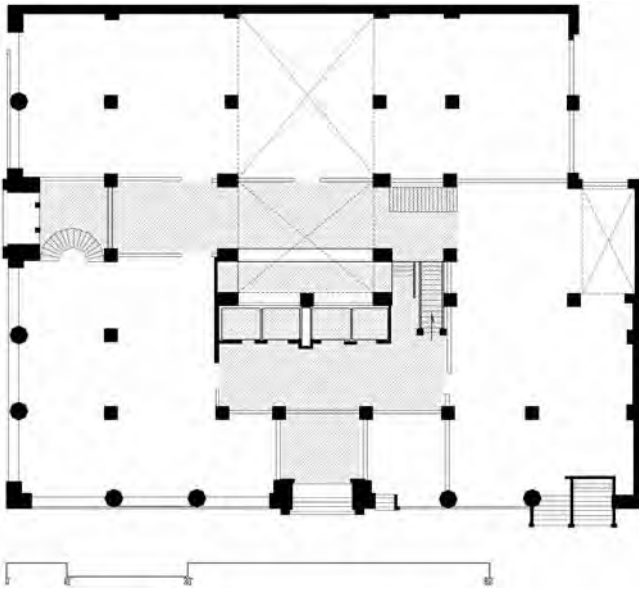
Ground floor plan, Guaranty Building (1894–96), Buffalo, N. Y., Adler & Sullivan
